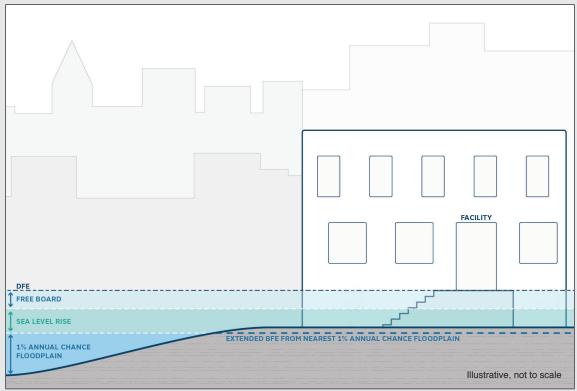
This schematic shows how to use a base flood elevation in the current floodplain, with sea level rise and freeboard, added, to determine a design flood elevation for a facility located in the future floodplain.
